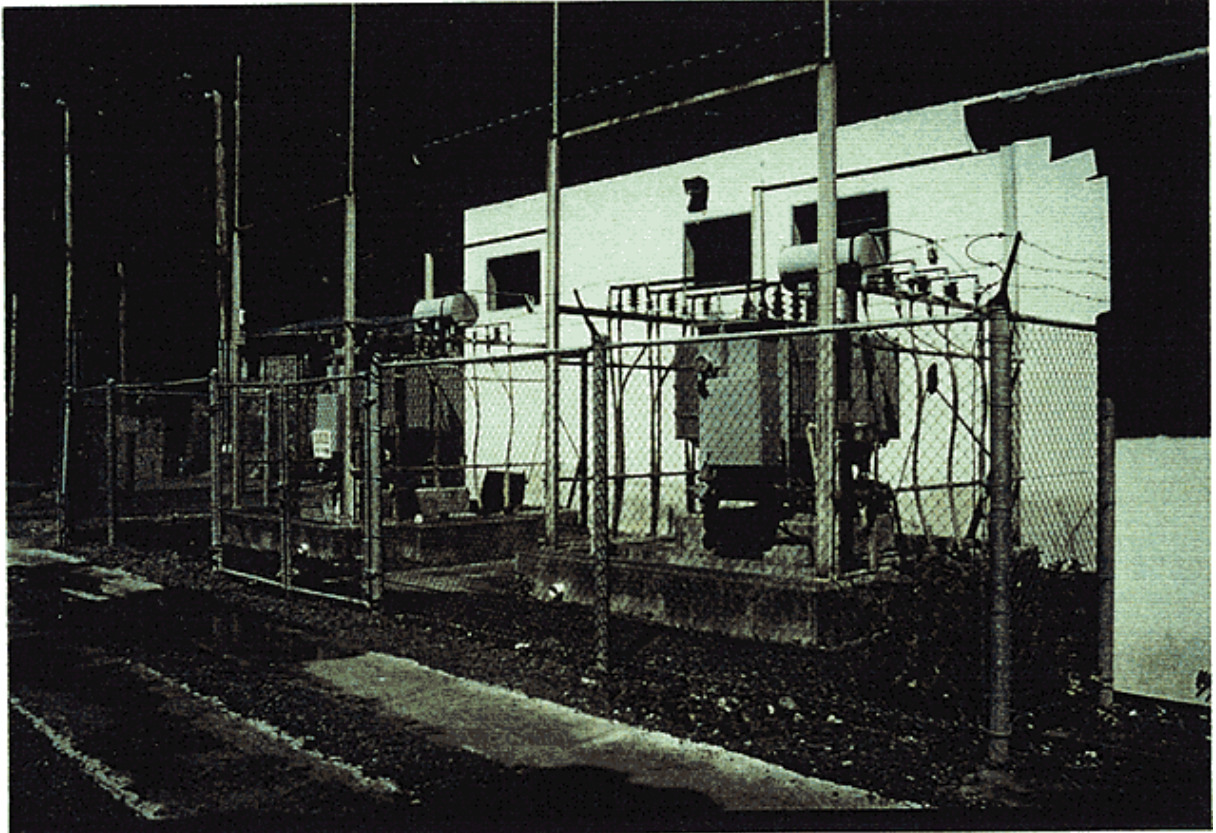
The switchyard facilities at the New Trafalgar powerhouse.
